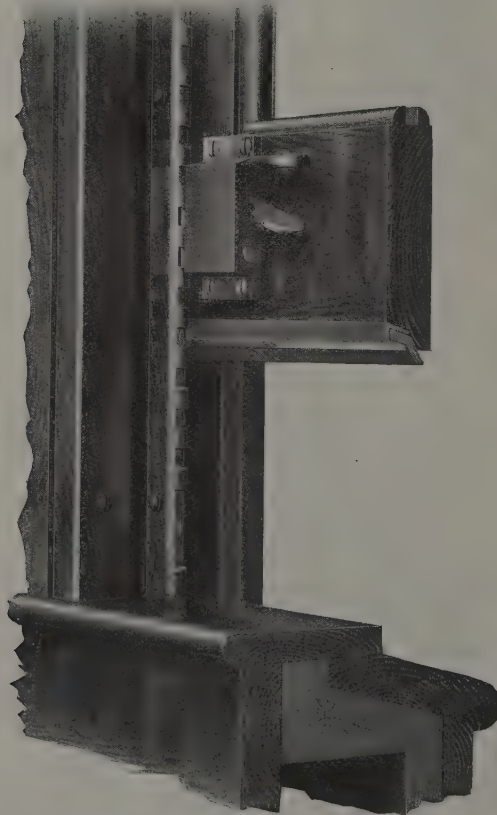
Universal Bottom Weather Stripping and No. 20 Wedging Sash Lock and Rack.
